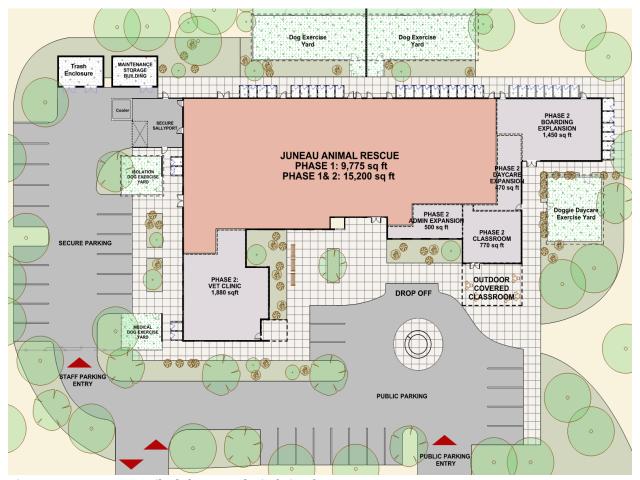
New Purpose-Built Shelter Hypothetical Site Plan
